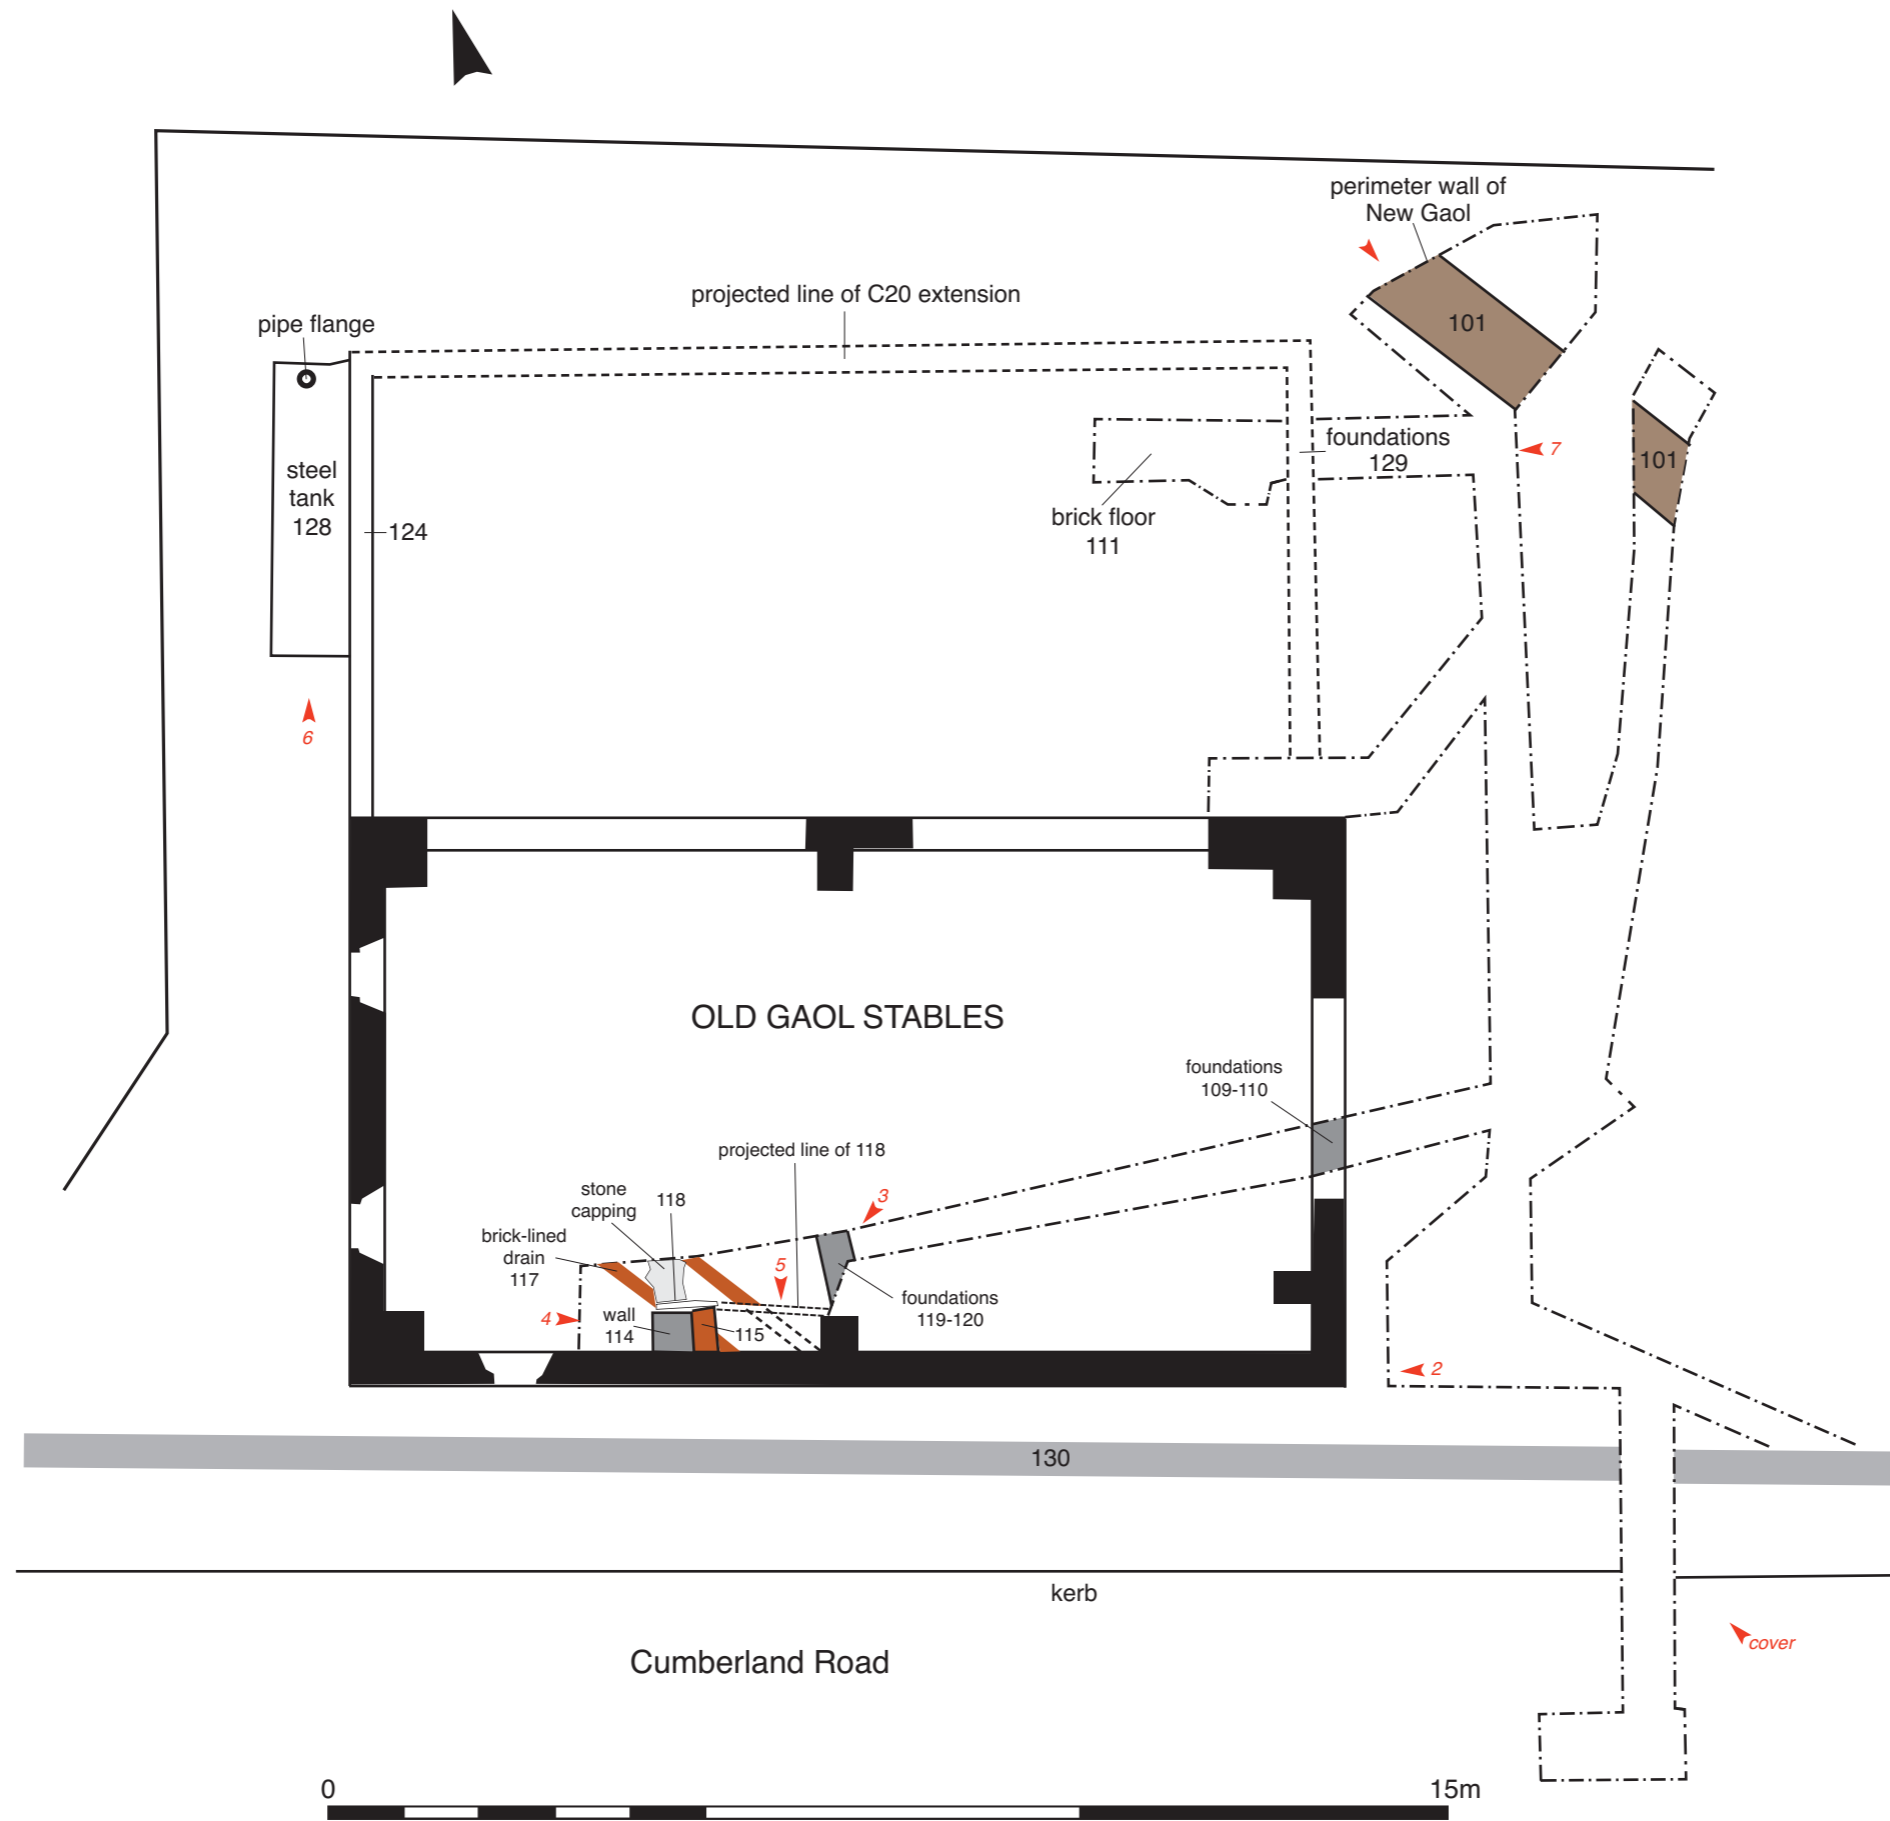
Site plan showing location of archaeological features and plate directions, scale 1:100
